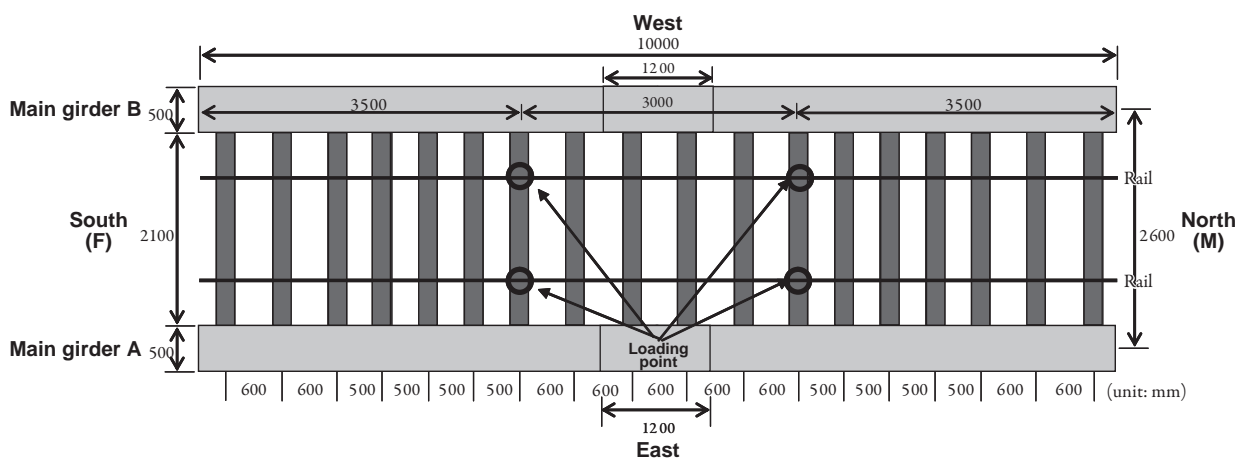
Specimen for Full-scale Loading Tests (plan)
